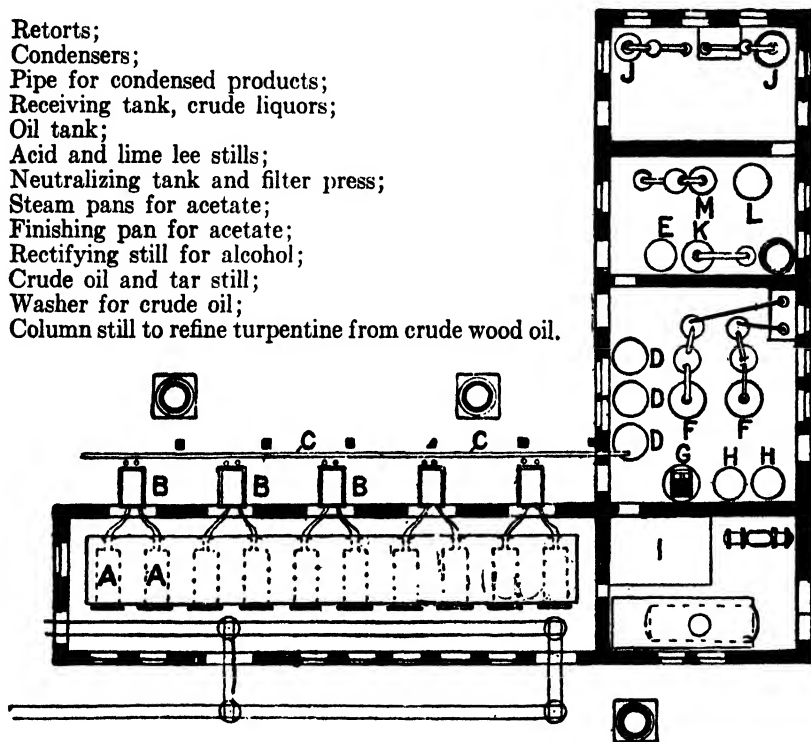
Plan of Complete Plant for Distillation of Resinous Wood.
